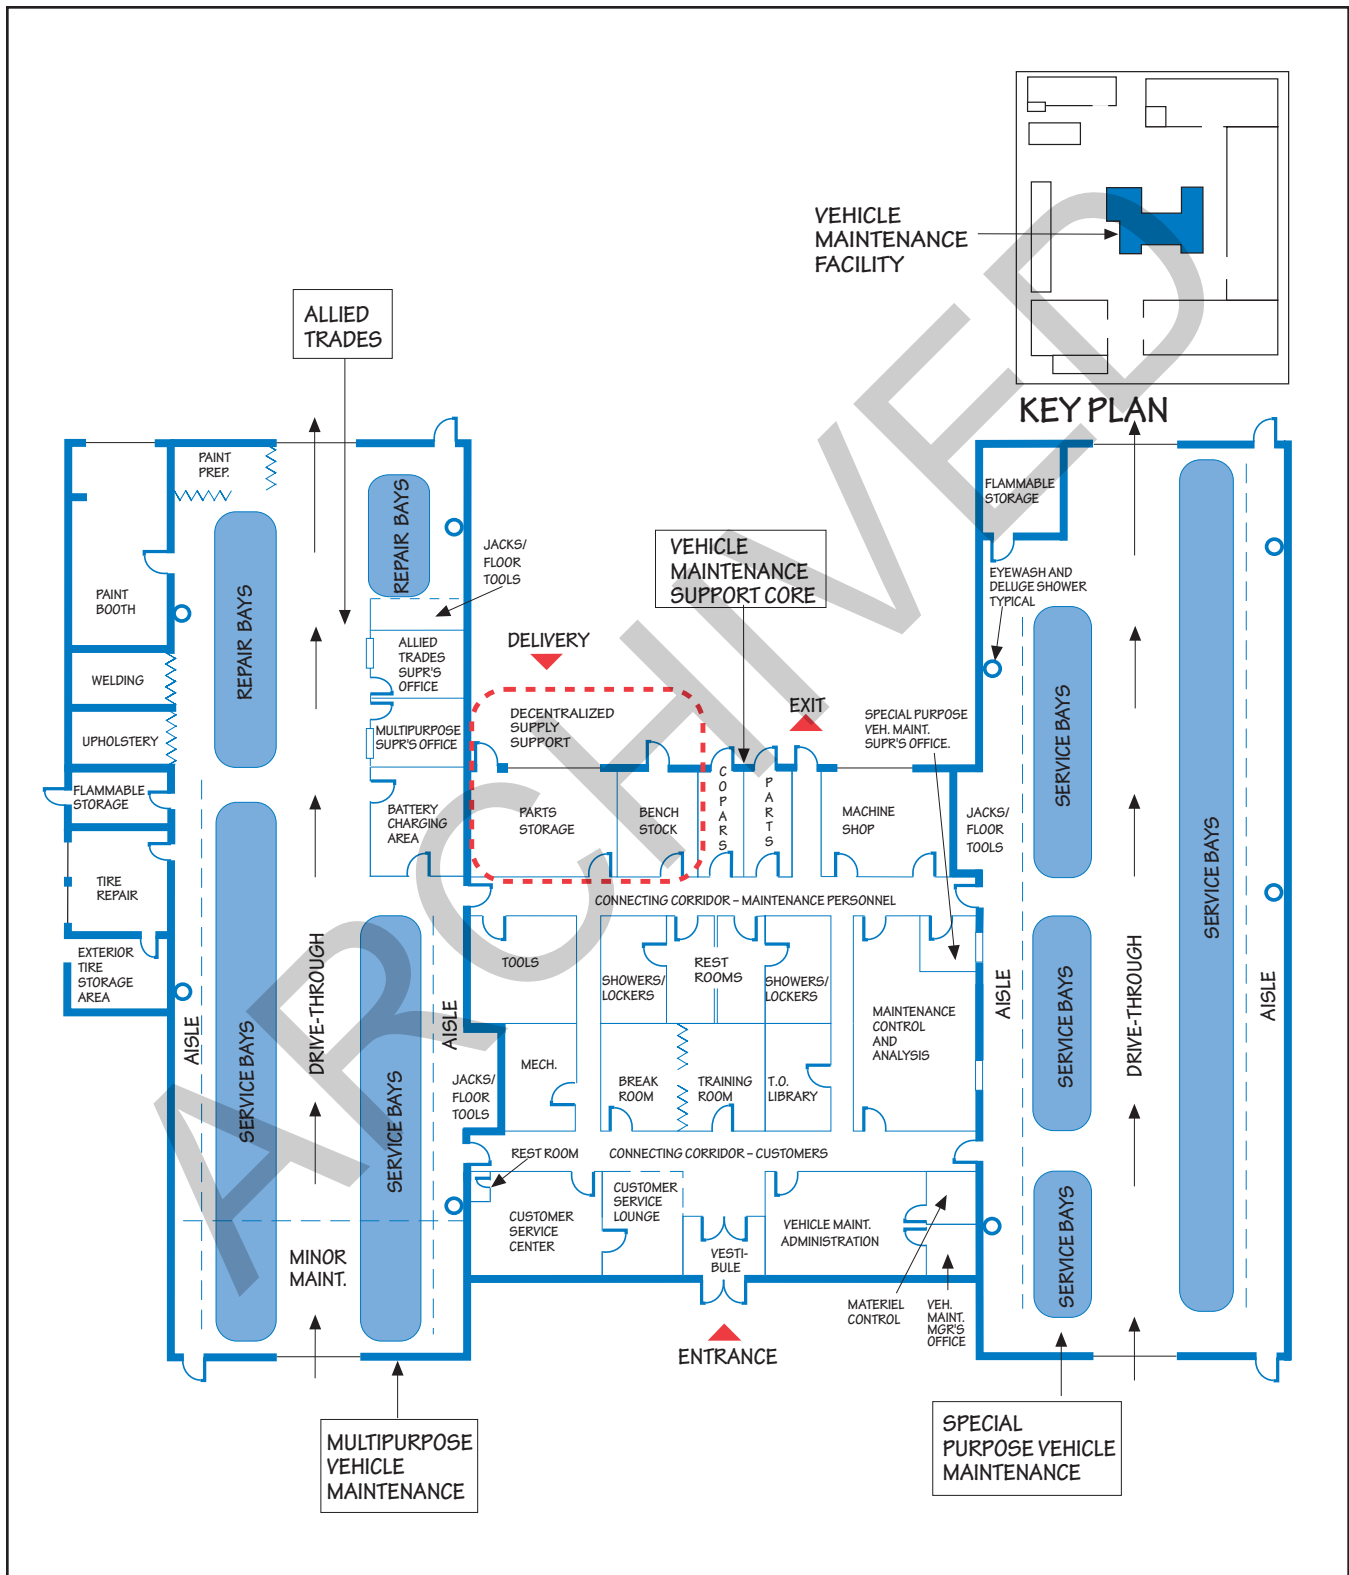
C: Illustrative Floor Plan for the Vehicle Maintenance Facility.
